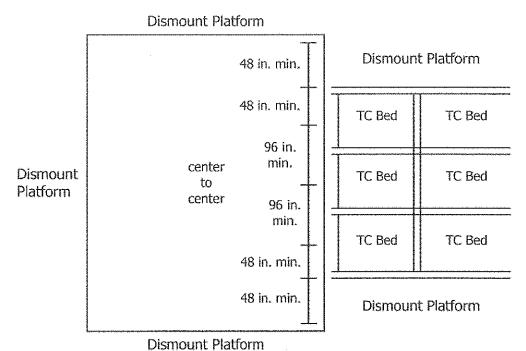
Example TC Foam Pit Overview With Dismount Platforms
